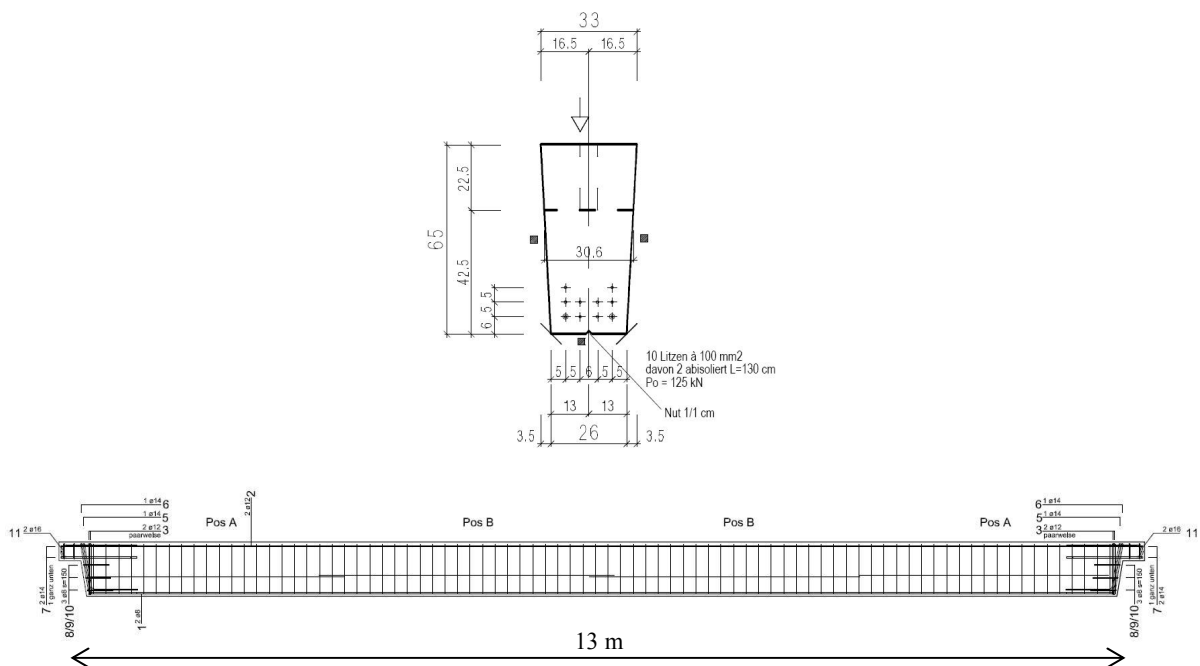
Cross section geometry and reinforcement arrangement of the full scale members
